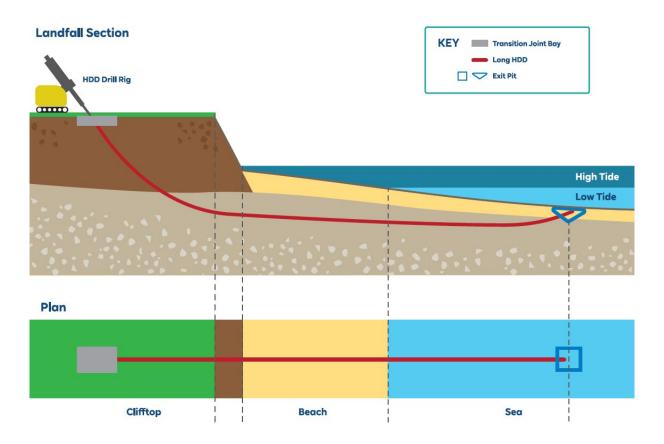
Illustrative Section and Plan Landfall Works HDD options
